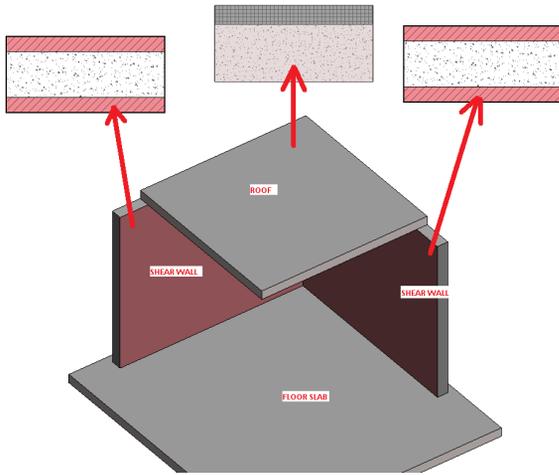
Concrete shear wall and slabs with cross sections showing their layers.
